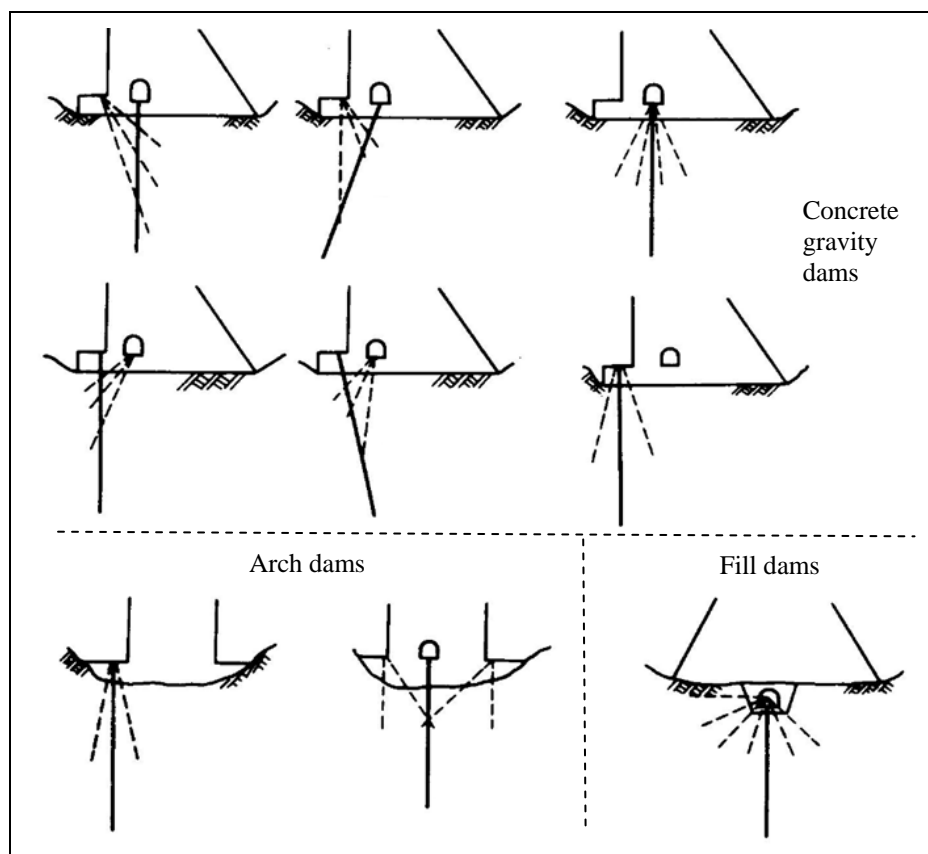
Examples of Arrangements of Curtain Grouting (1)
